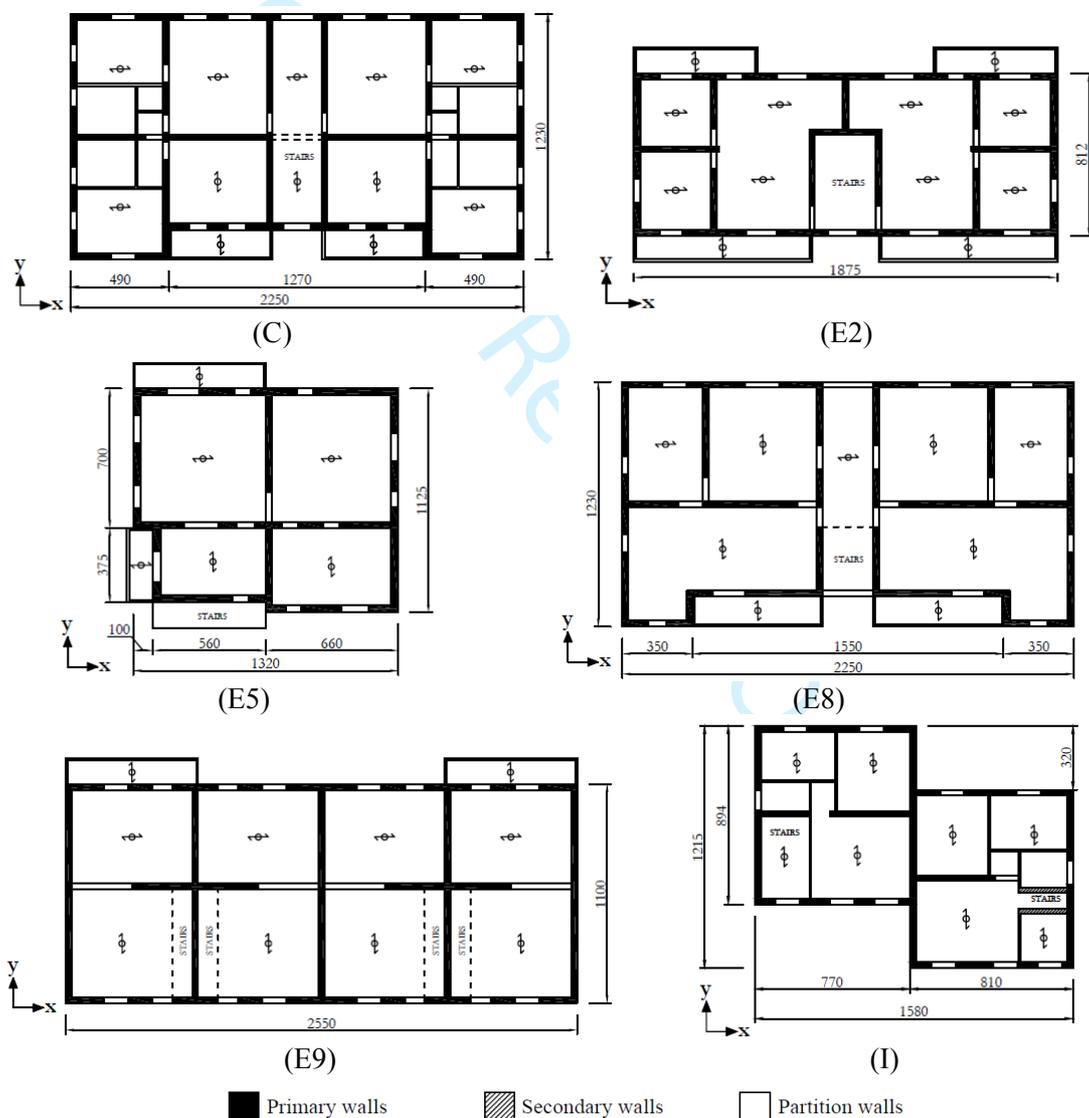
Selected architectural plan configurations (structural variations, namely C1 to C7, were then created starting from the reported “C” type plan, derived in turn from E8) Dimensions in the plans are in cm.
